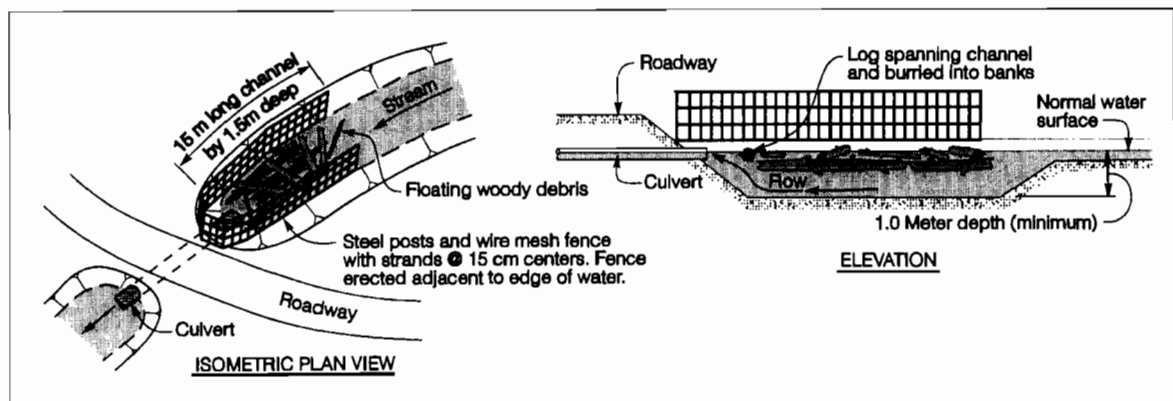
The Telkwa design concept adapted to a road culvert.
